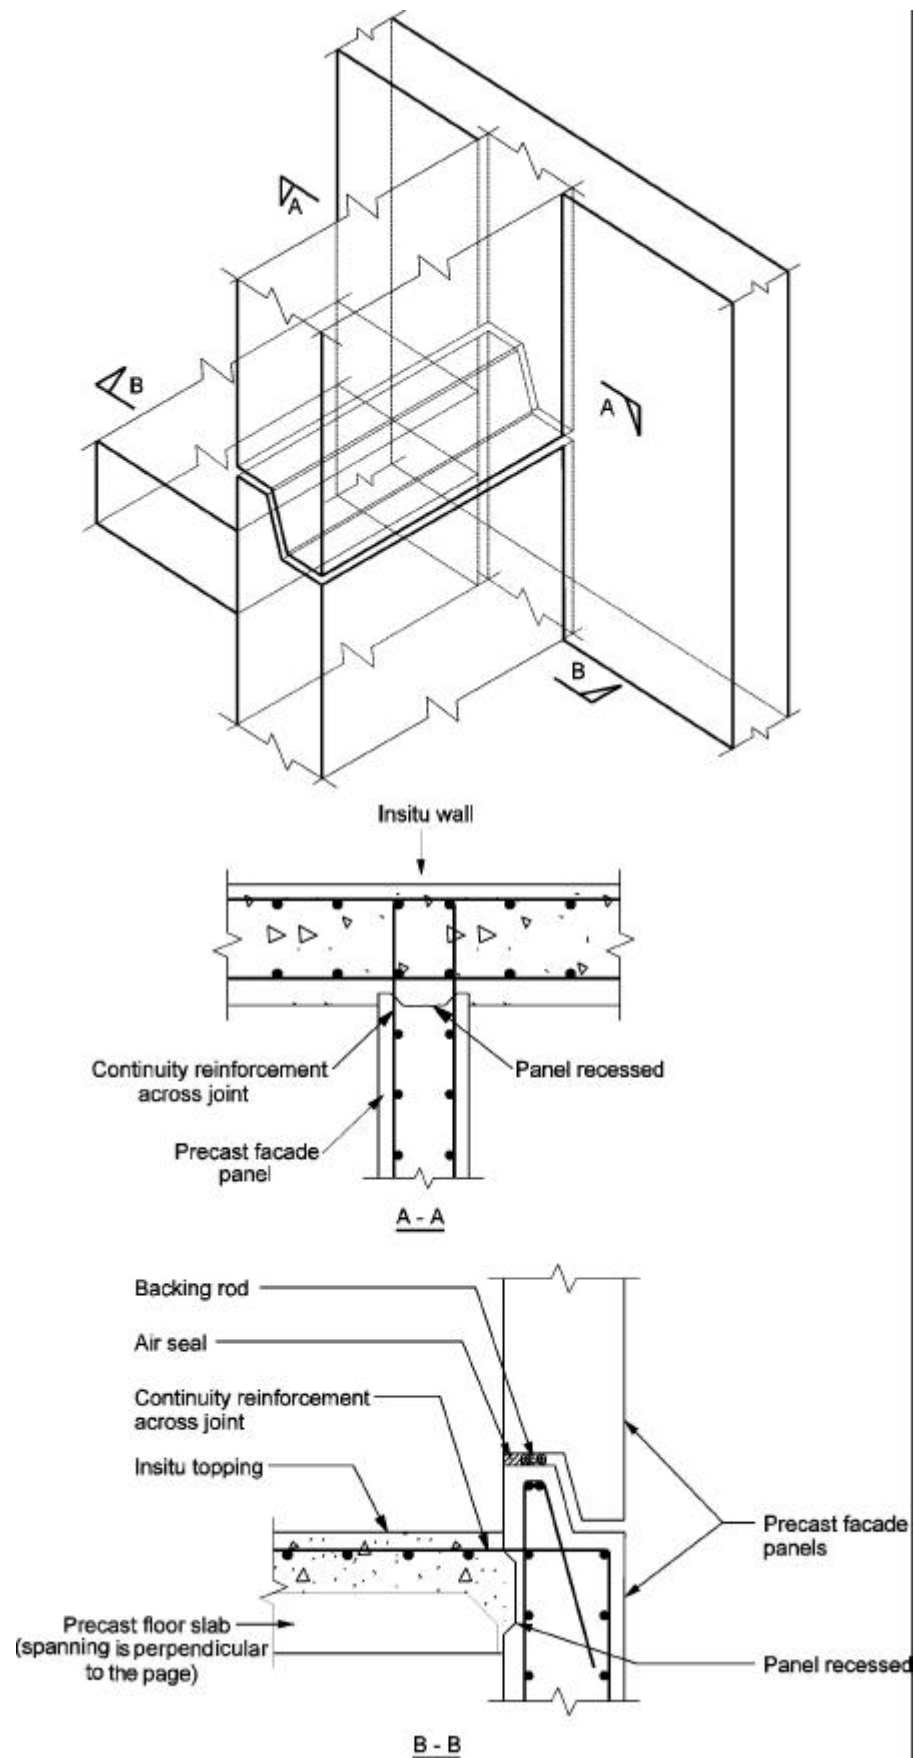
Precast panel to insitu concrete: joint intersection
